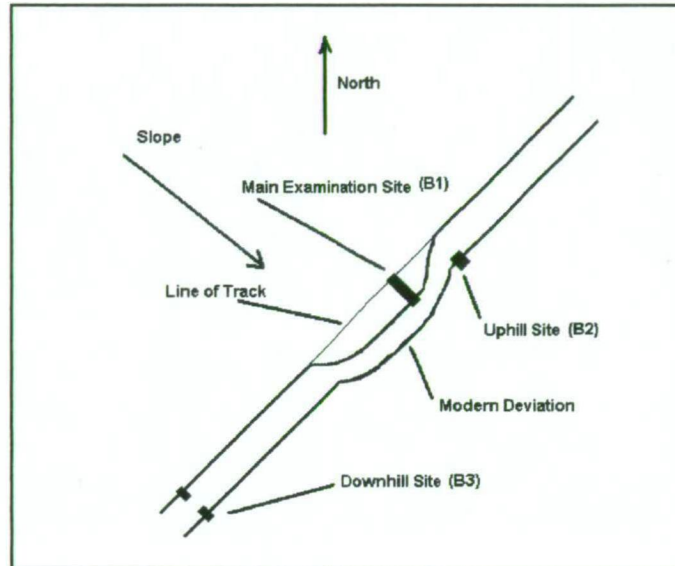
Sketch Plan of Location of Sites for Benched Track
